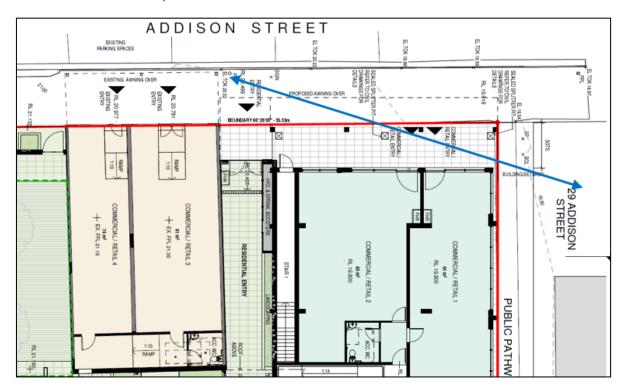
Line of sight between No. 29 and 35 Addison Street, public laneway and proposed development
